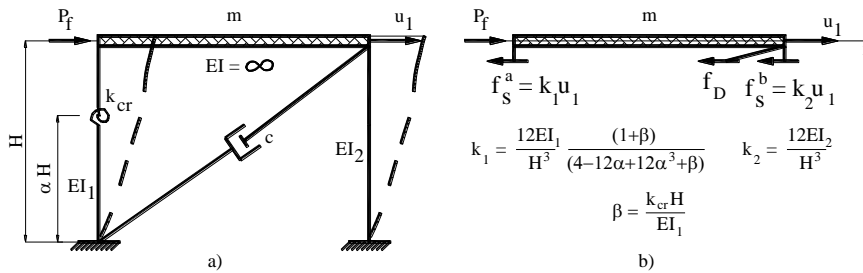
Model of single-storey building frame with a crack in the column
